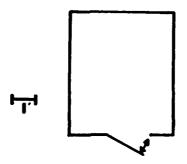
Cunningham outbuilding. Plan of Toilet/Privy .
